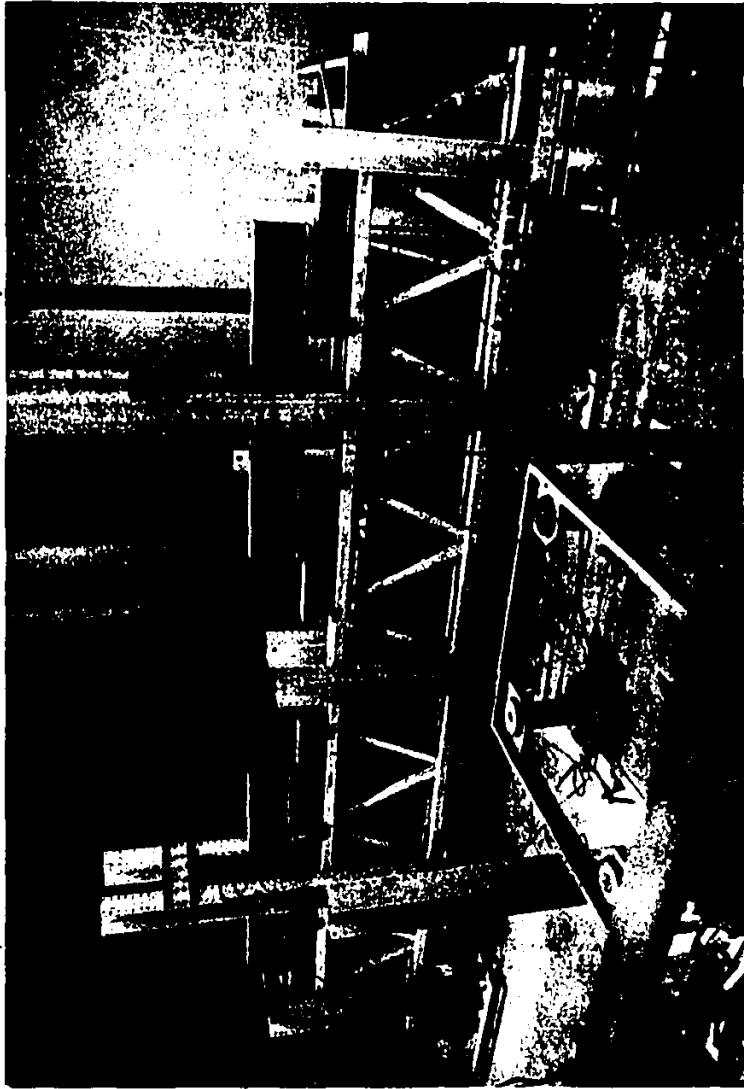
GENERAL VIEW OF TRUSS AND LOADING SYSTEM
